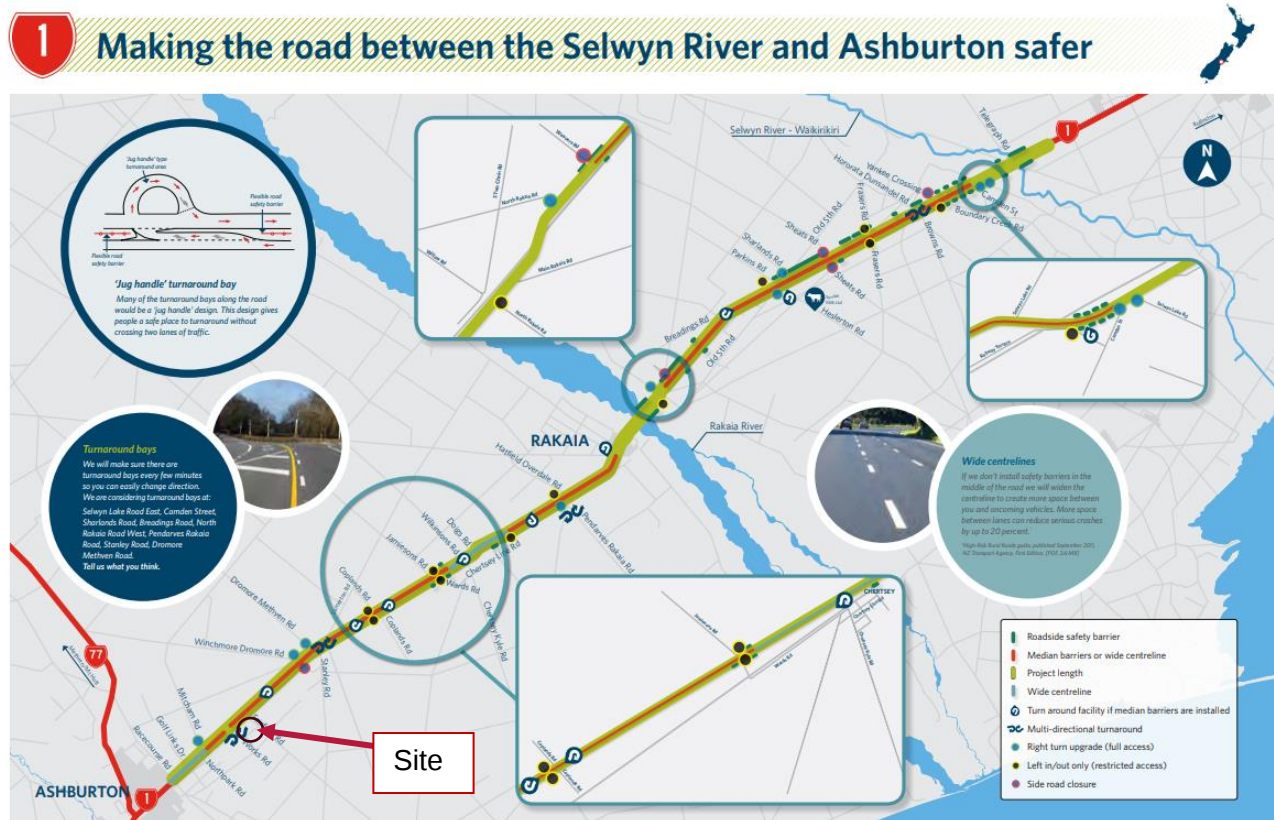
Concept plan for SH1 safety upgrade between Selwyn River and Ashburton. (Source: Waka Kotahi).
